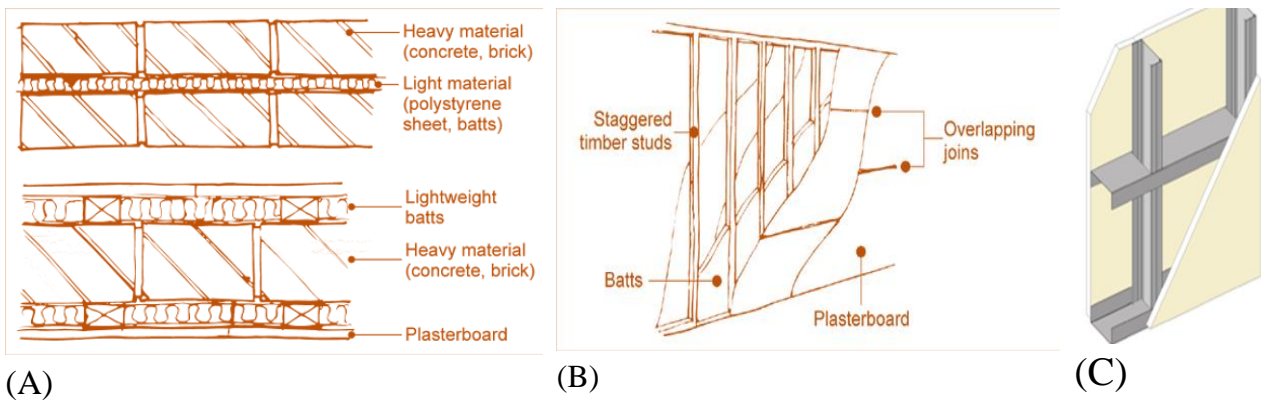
(A) and (B) and (C) Explain Detail Internal wall (Partitions) source [13]
